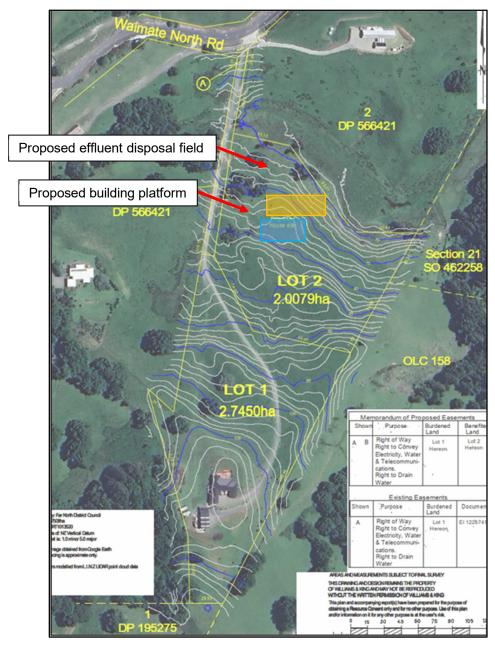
Proposed subdivision plan (Williams and King Ltd).
